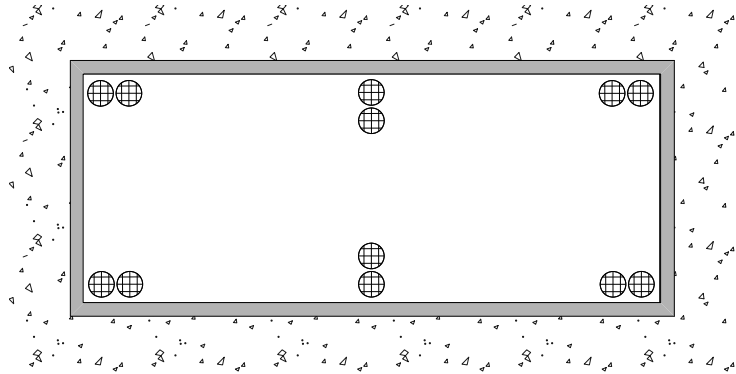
(a) - Typical arrangement of vent stacks (plan view). Total number will depend on pit floor area
